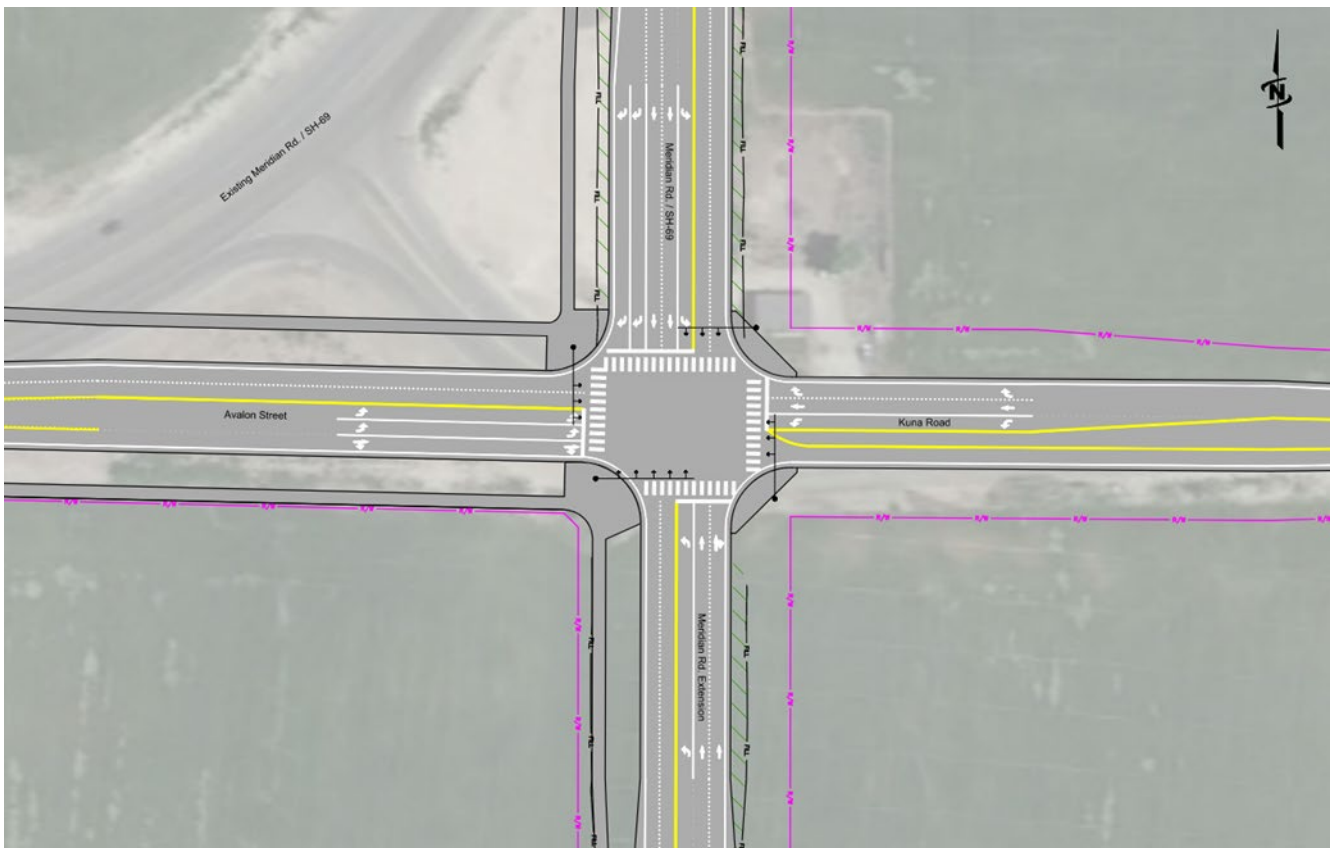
Proposed intersection configuration for Meridian Road/SH-69 and Avalon Street/Kuna Road
